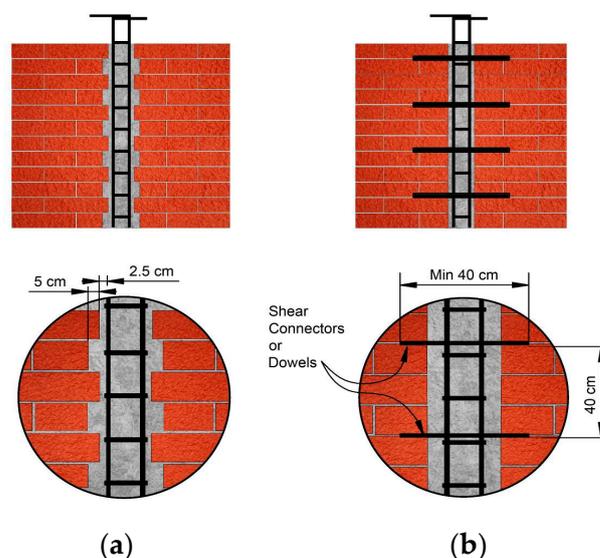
Wall-to-tie-column interface: (a) tothing; (b) horizontal steel dowels.
